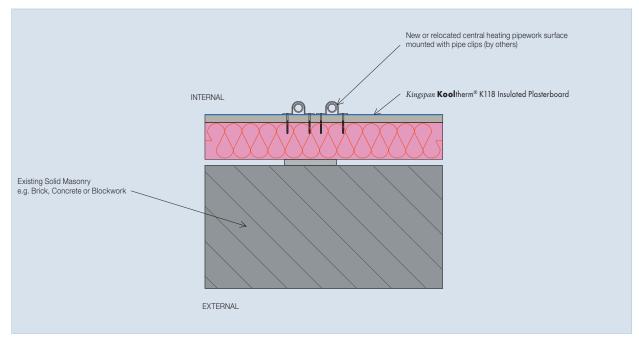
Central Heating Pipework Behind or on the Surface of Kingspan Kool therm® K118 Insulated Plasterboard (Adhered)
